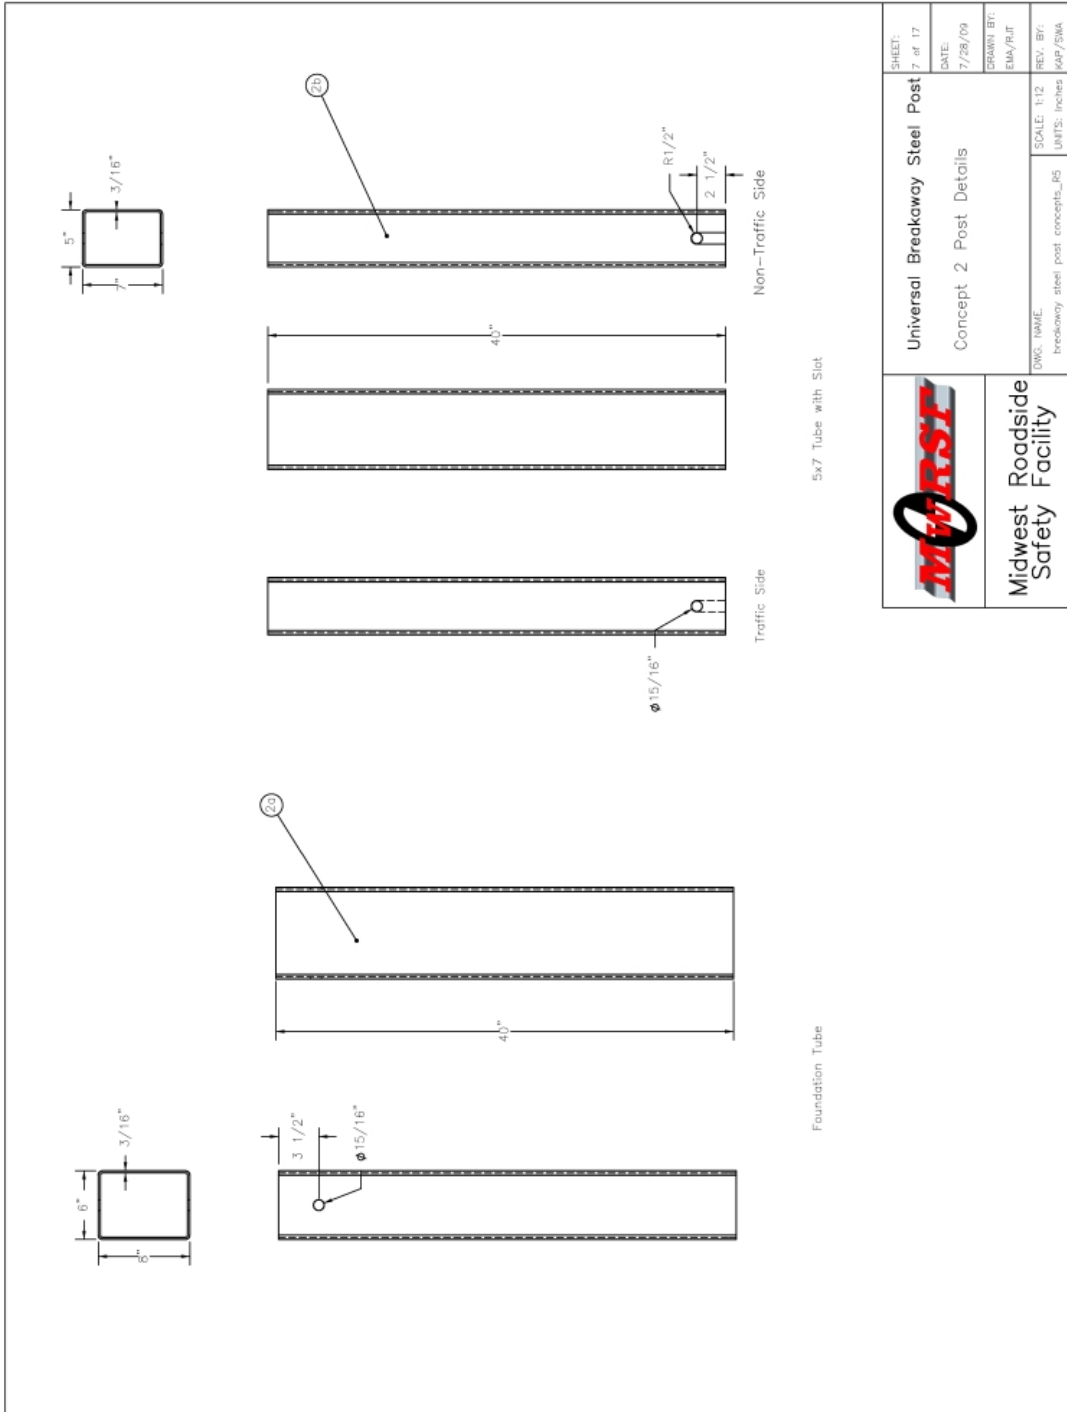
Steel Tube In Steel Tube With Thru Bolt Assembly Details
